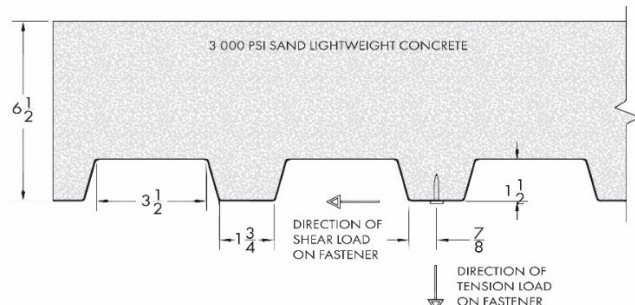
B—FASTENER INSTALLATION IN 1 1/2-INCH-DEEP STEEL DECK
